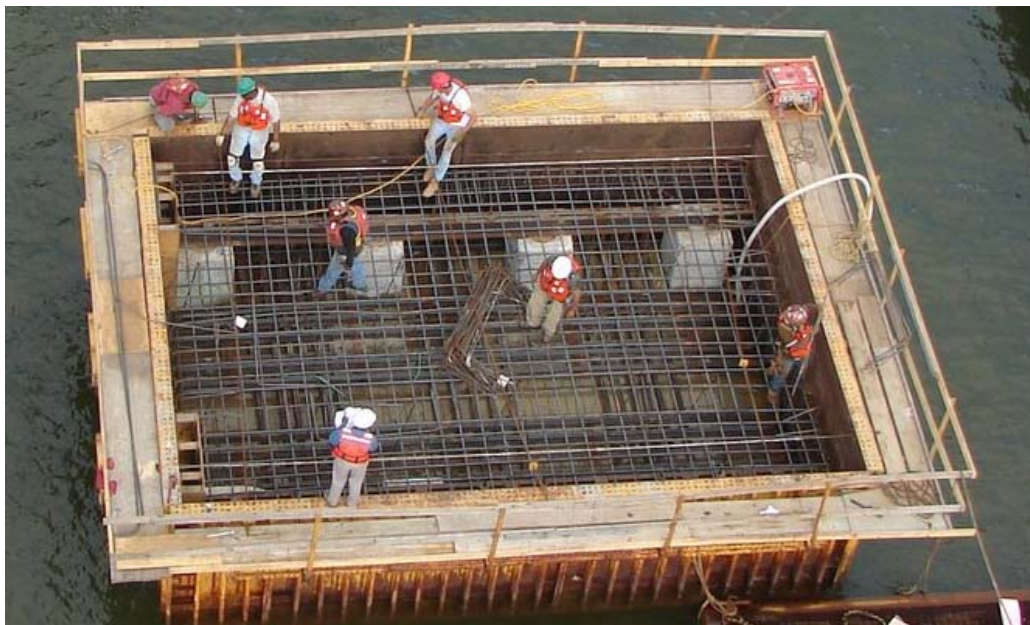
Waterline footing at Bent 42 being prepared for concrete placement.
